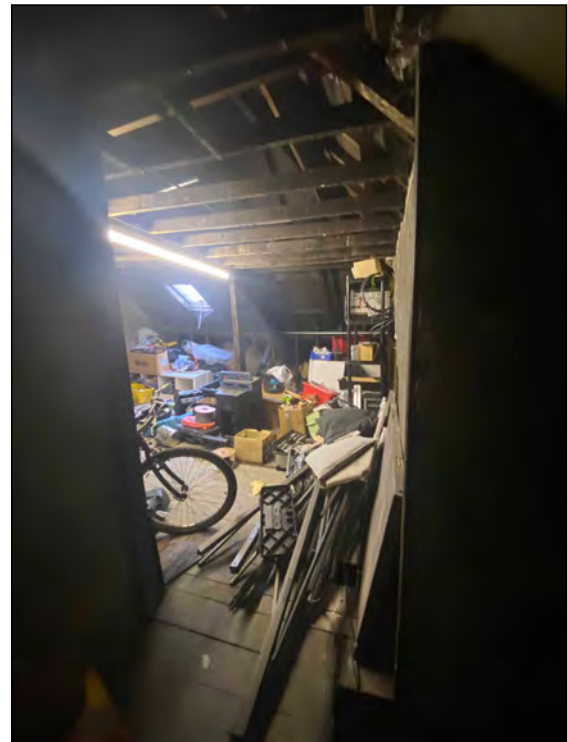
View looking SE, through entrance from NW room to SW room of attic space.
